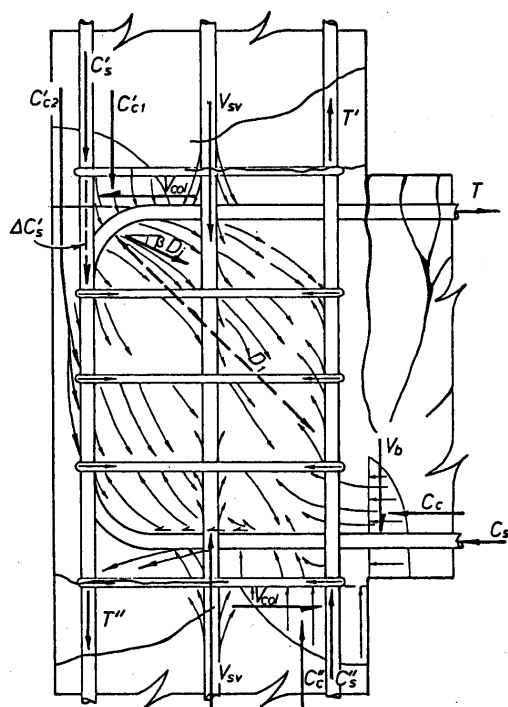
7: Compressive stresses strut of concrete in a joint core from [46]
